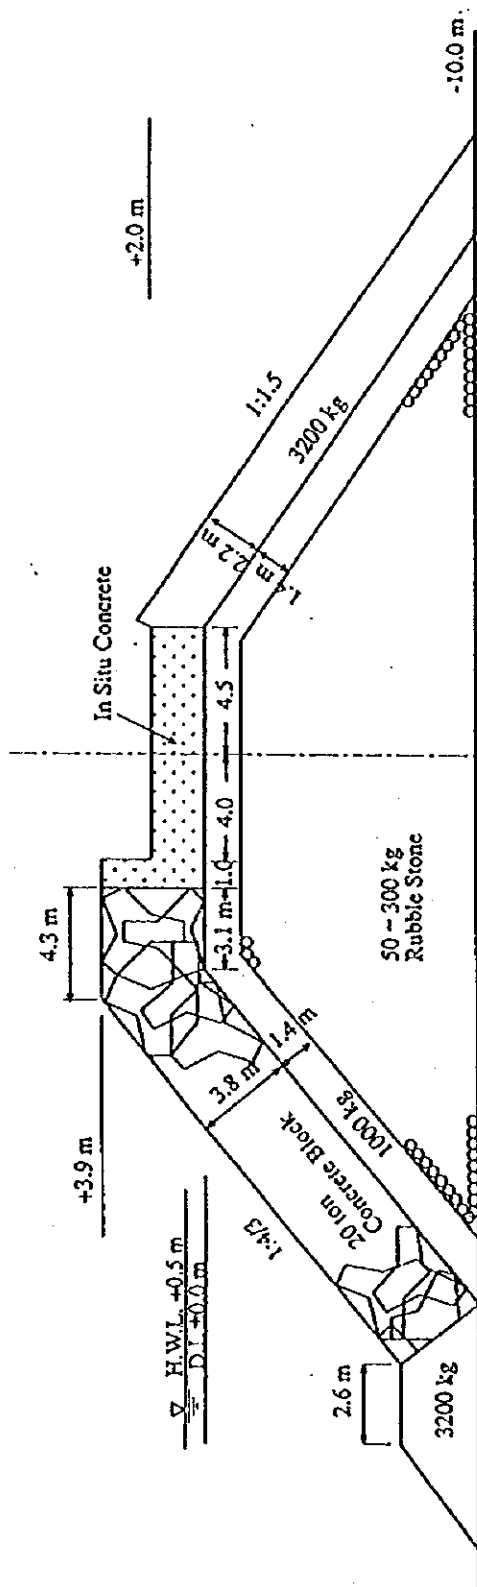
Standard Cross Section of Breakwater (-10.0m)
